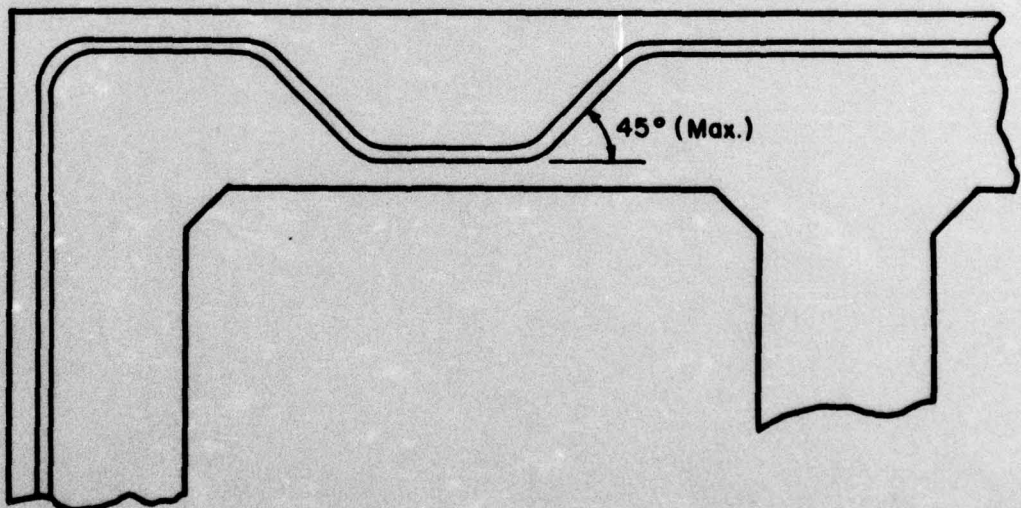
INEFFECTIVE USE OF BENT-BAR REINFORCEMENT IN DEEP MEMBER
